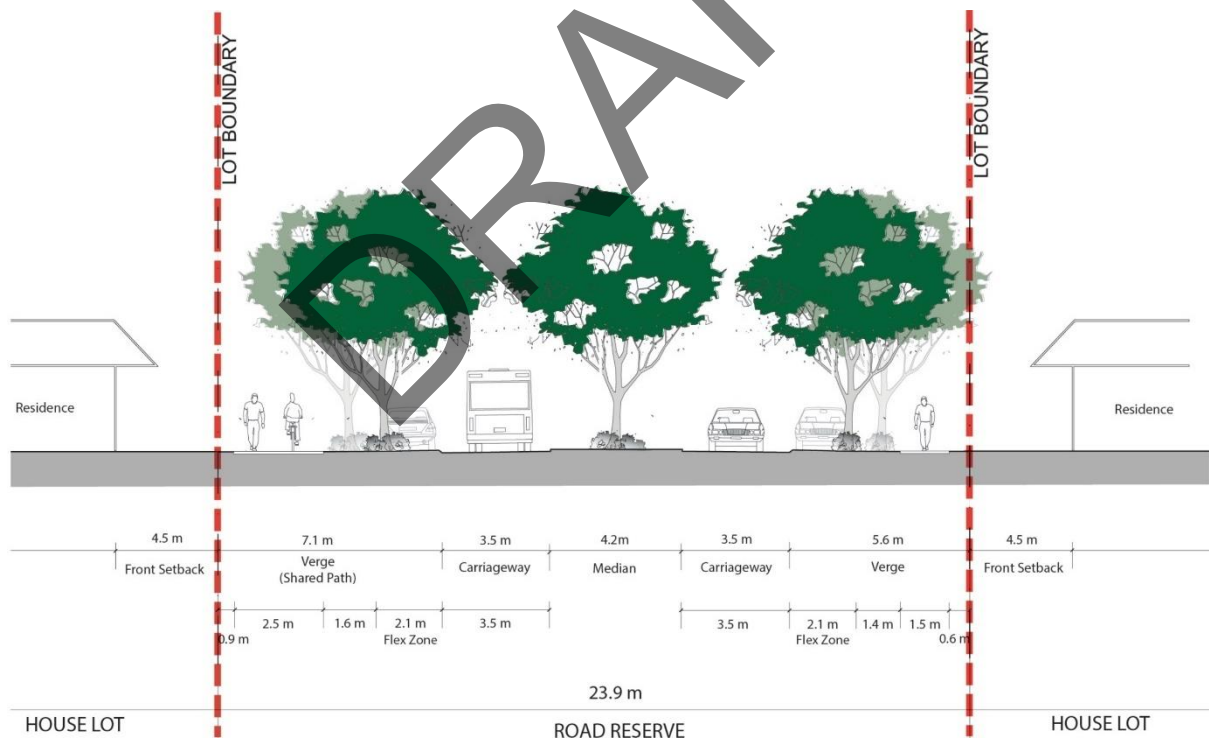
Collector Road Cross Section – Median (Flex Zone)
